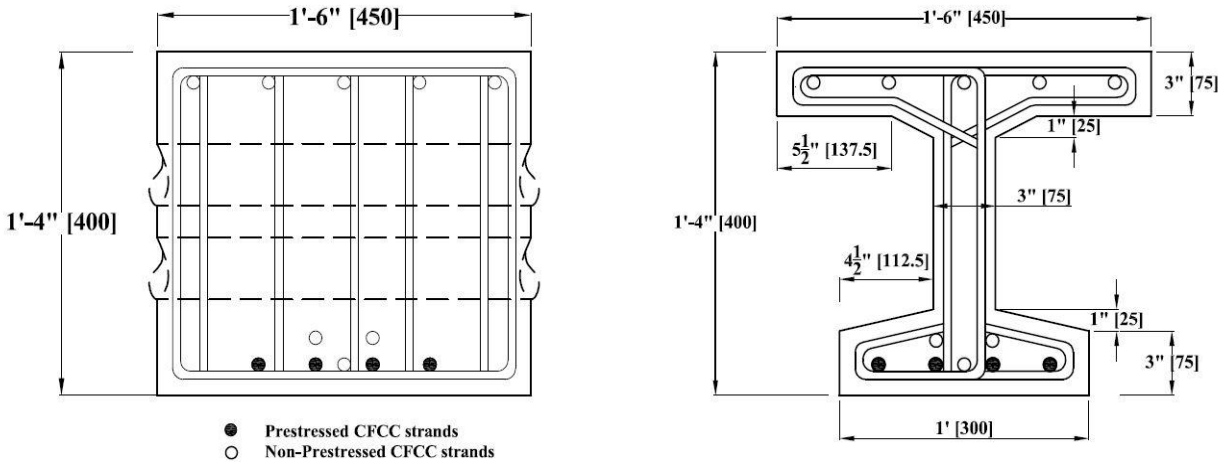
Details of cross section 1-1 (left) & 2-2 (right) of the beam specimen
